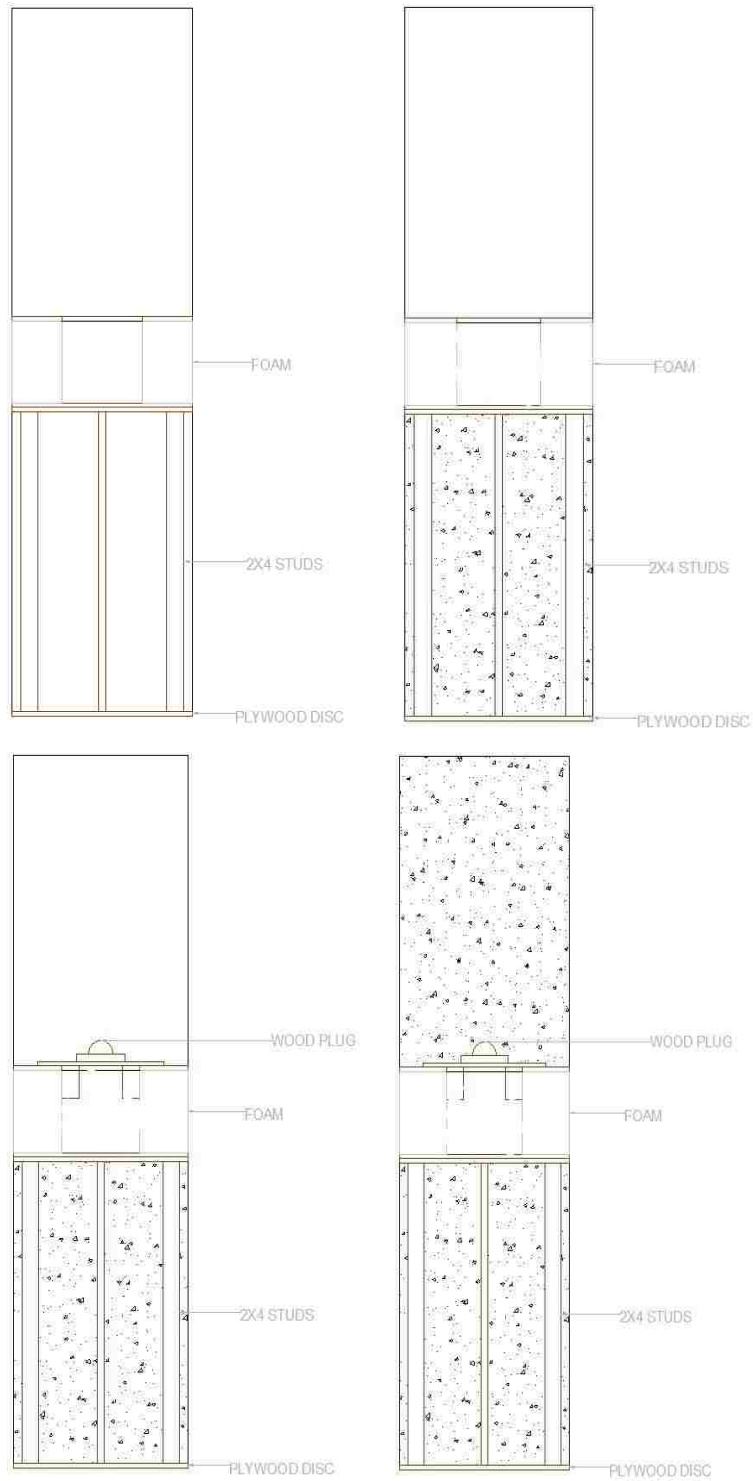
Top left: Vertical specimen with formwork; Top right: Bottom half of Four-point bending specimen fill concrete; Bottom left: Plug over hose hole; Bottom right: Top half of fill concrete
